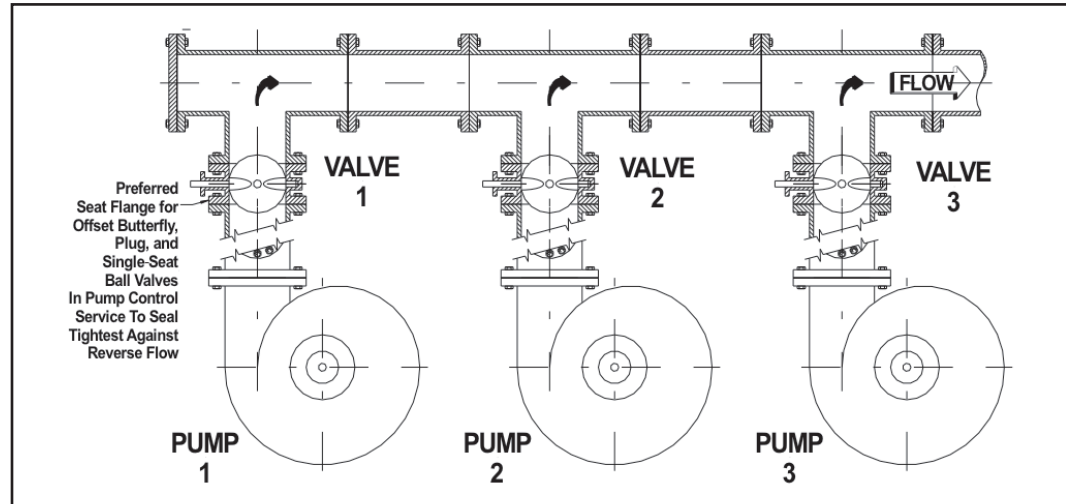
Multiple-pump installation; example shown with butterfly valves
